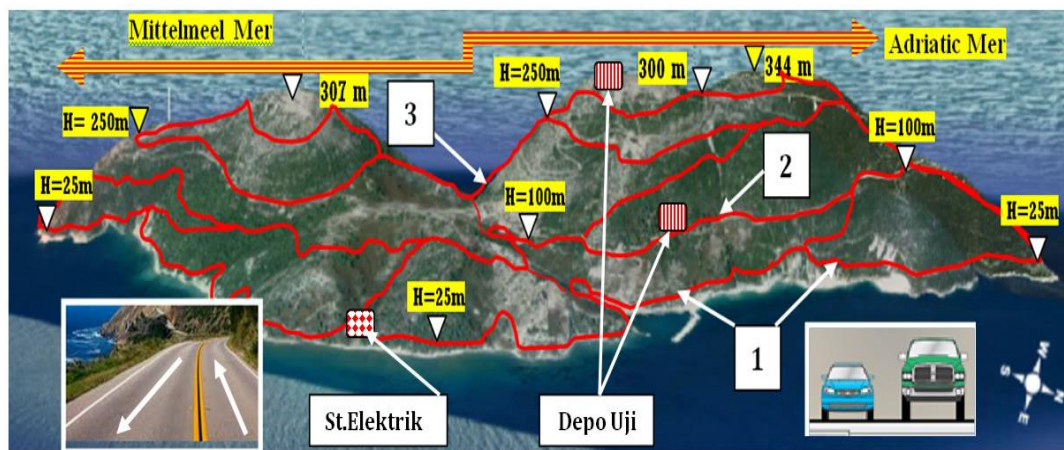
2 Road construction in the Island at height of 25m, 100m, and 250 m. East View. Perspective; 1) Road construction at height of 25 m; 2) Road construction at the height of 100 m; 3) Road at the height of 100m & 250m; 4) Water Depots; 5) Power Station
